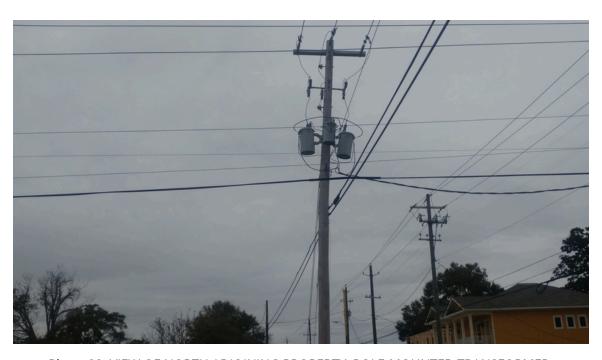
VIEW OF NORTH ADJOINING PROPERTY, POLE-MOUNTED TRANSFORMER.
